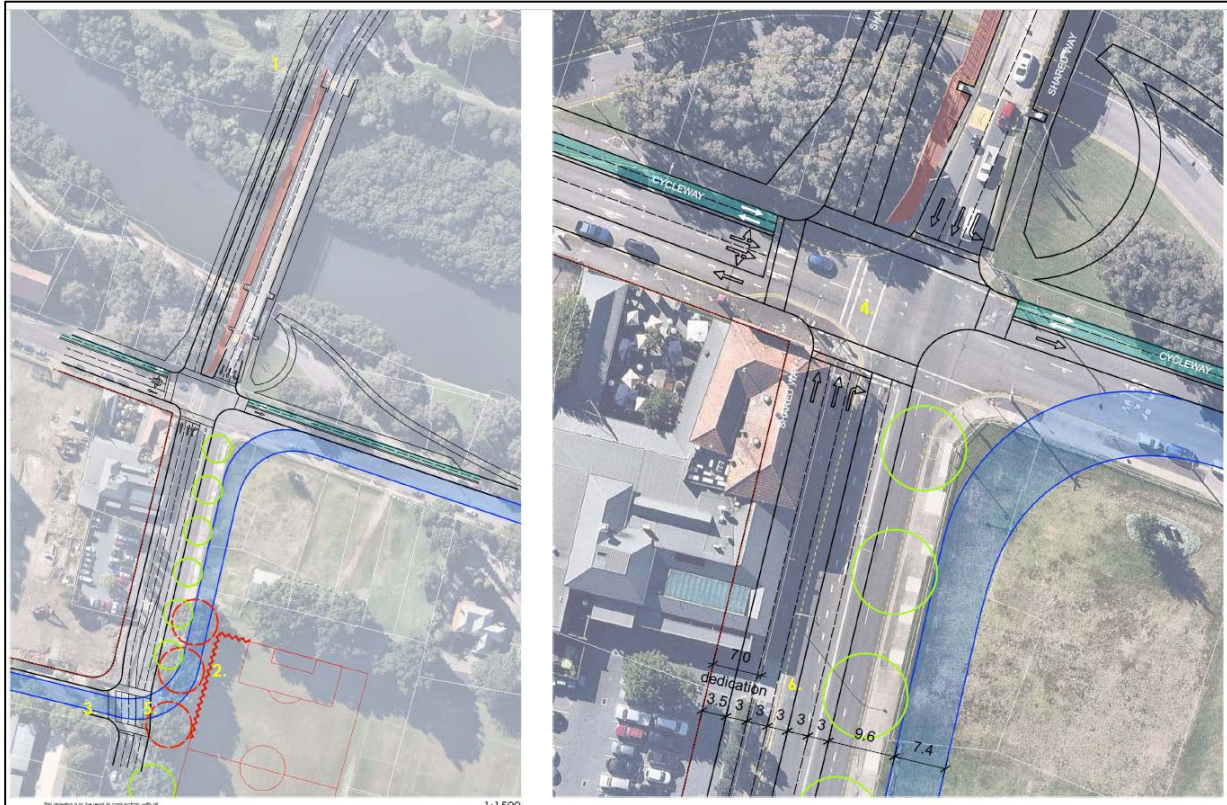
Potential road widening requirements as a result of Gasworks Bridge duplication
